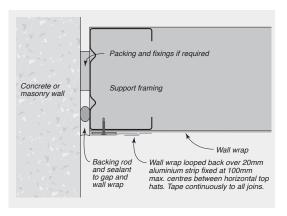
Abutment to Concrete or Masonry Wall
